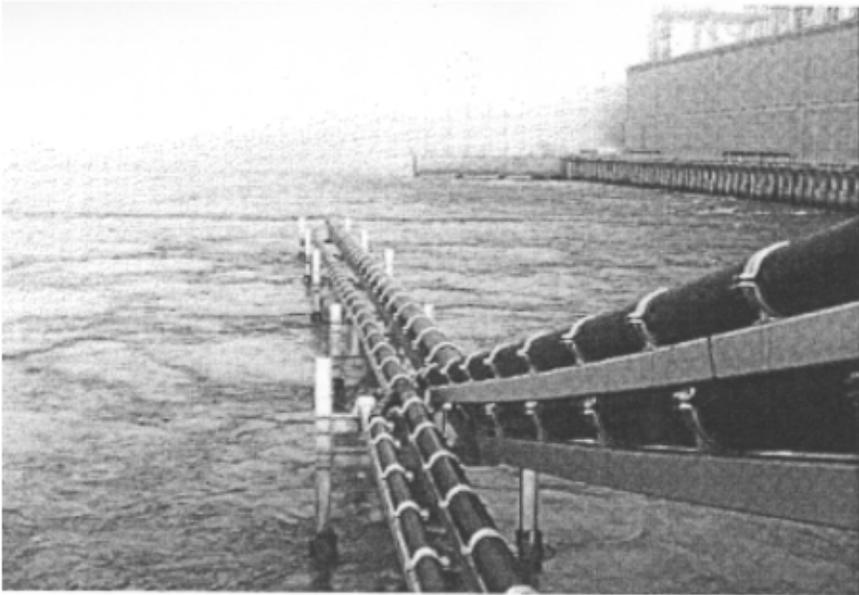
McNary Dam Juvenile Bypass System Outfalls
